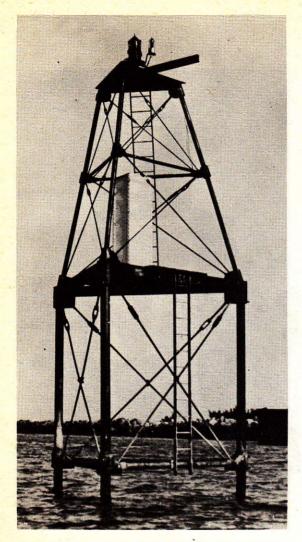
Iron-pile minor light structure on marine site.
